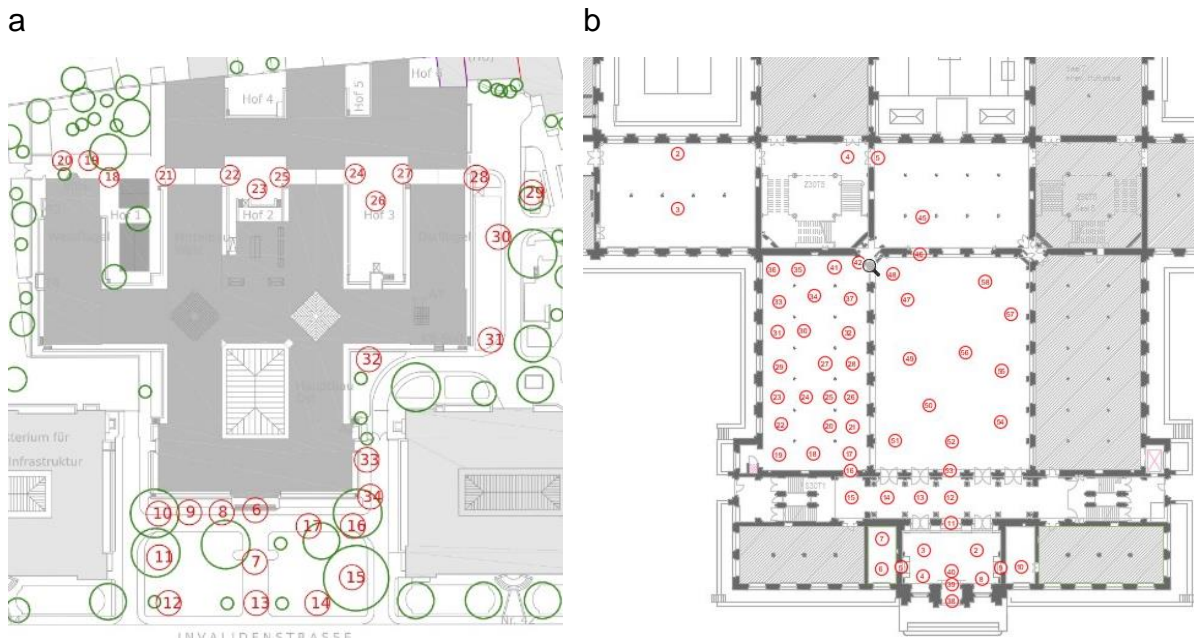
Pre-planning for demonstration the stations place, (a) is outside stations plan, (b) inside stations plan (by author)
